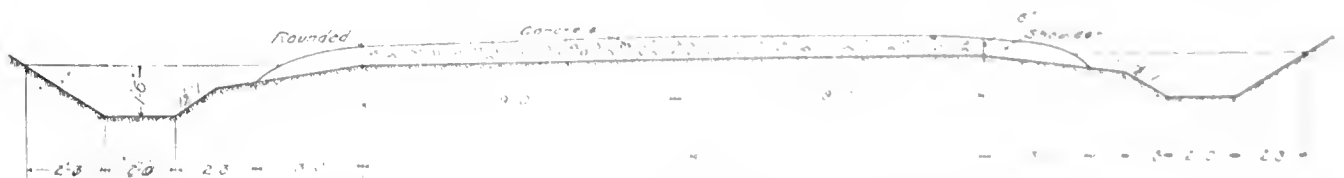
Section of Toronto-Hamilton concrete roadway—26 ft. overall, width of concrete 18 ft.
